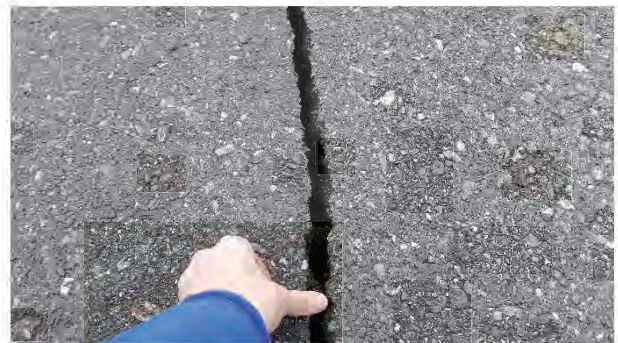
Asphalt cracks in known release area at north end of runway 02/20.
